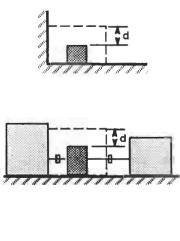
Example of Machinery Mounted on the Floor or by a Wall
